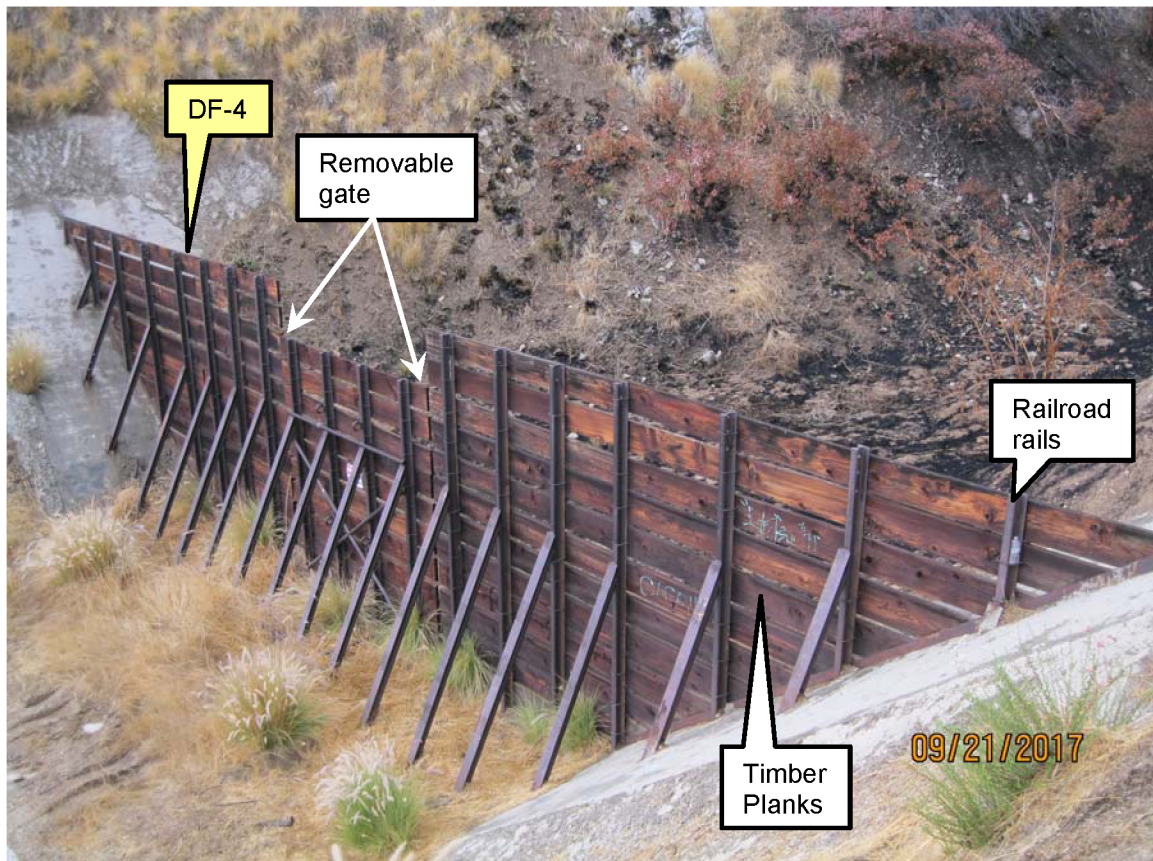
Standing downstream and looking toward DF-4 and the typical debris fence construction consisting of concrete-embedded steel railroad rails and creosote-treated timber planks. Note the vertical spacing between the planks, and the removable gate in the center of the fence.
